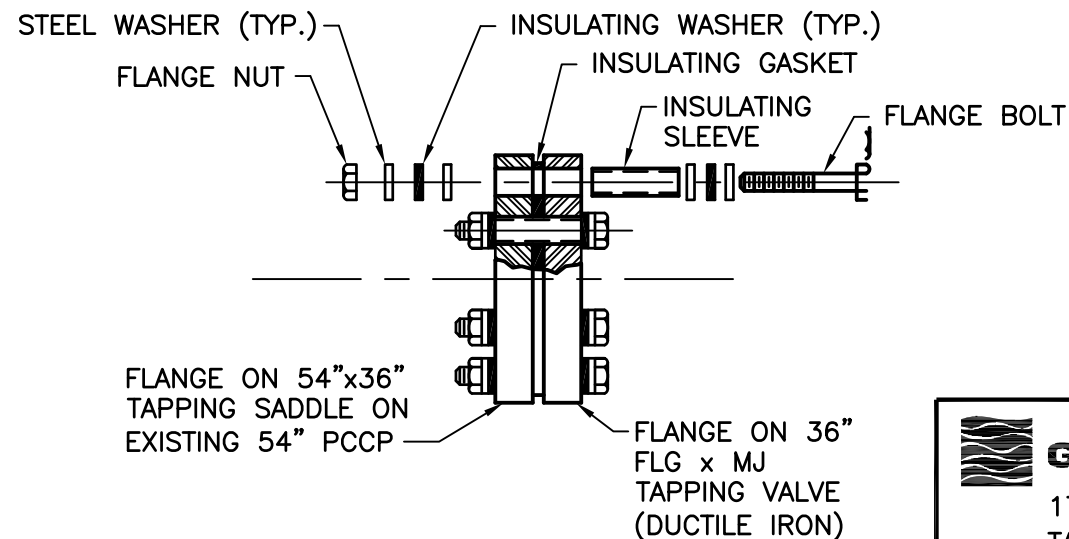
DETAIL OF PIPE CONNECTION TO EXISTING 54" PCCP
